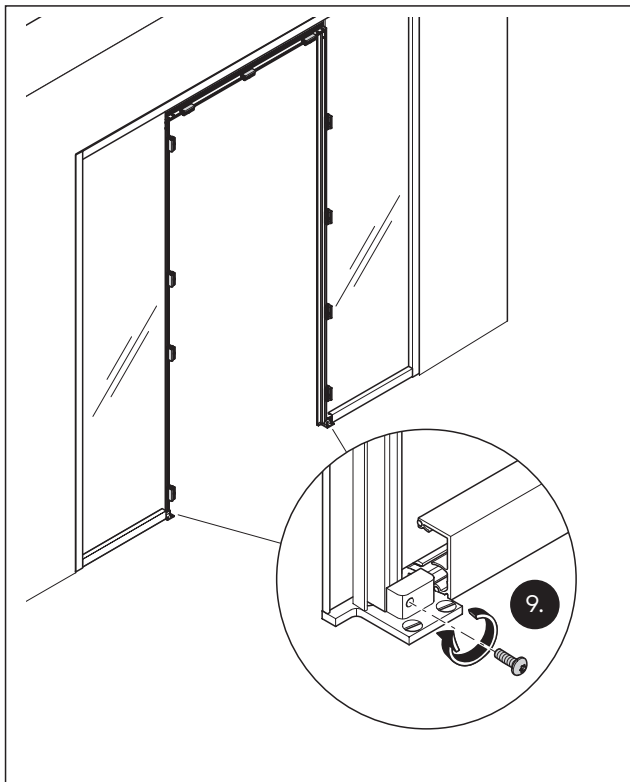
Connect the base profile for the door frame with the door frame positioners
